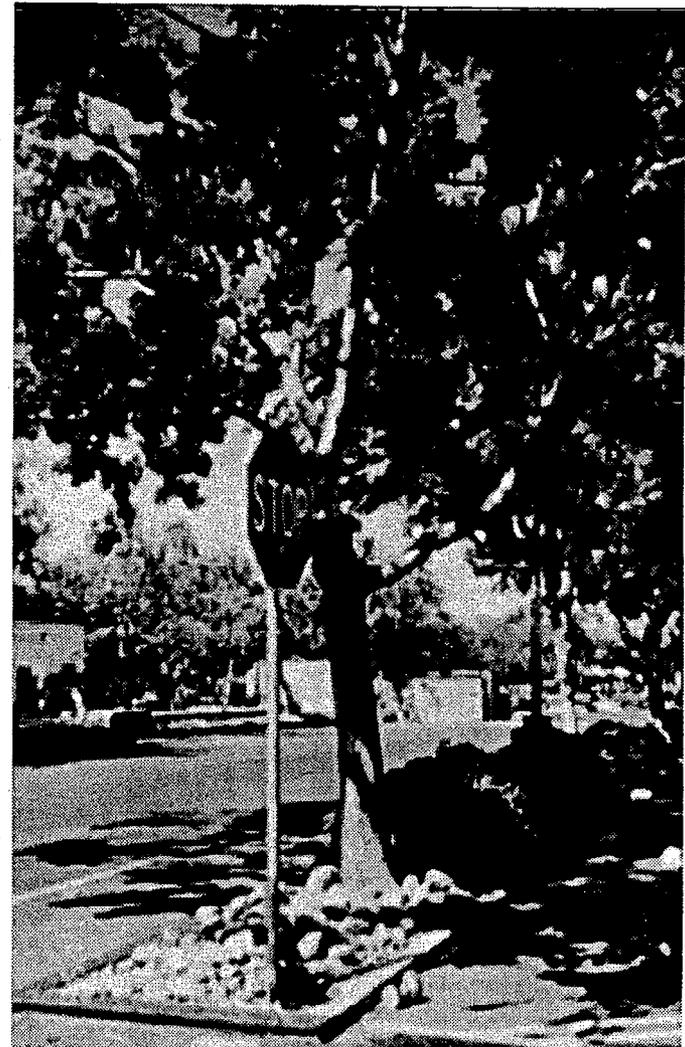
Rectangular planter with 9" cobble stones used as surface material. Mulberry trees have been lowered 12" to prevent surface root damage to asphalt.
